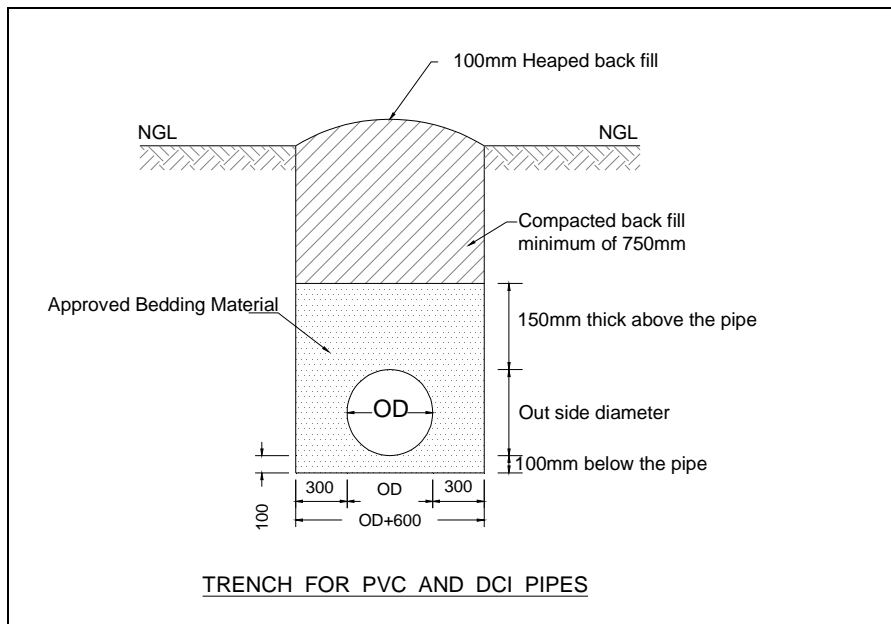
Typical Pipe Trench for PVC and DCI pipes
